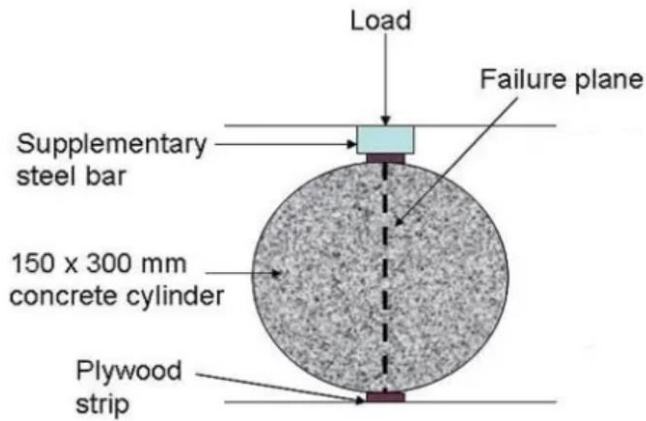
TENSILE SPLITTING STRENGTH OF CONCRETE (THE CONSTRUCTOR.COM 2021)
